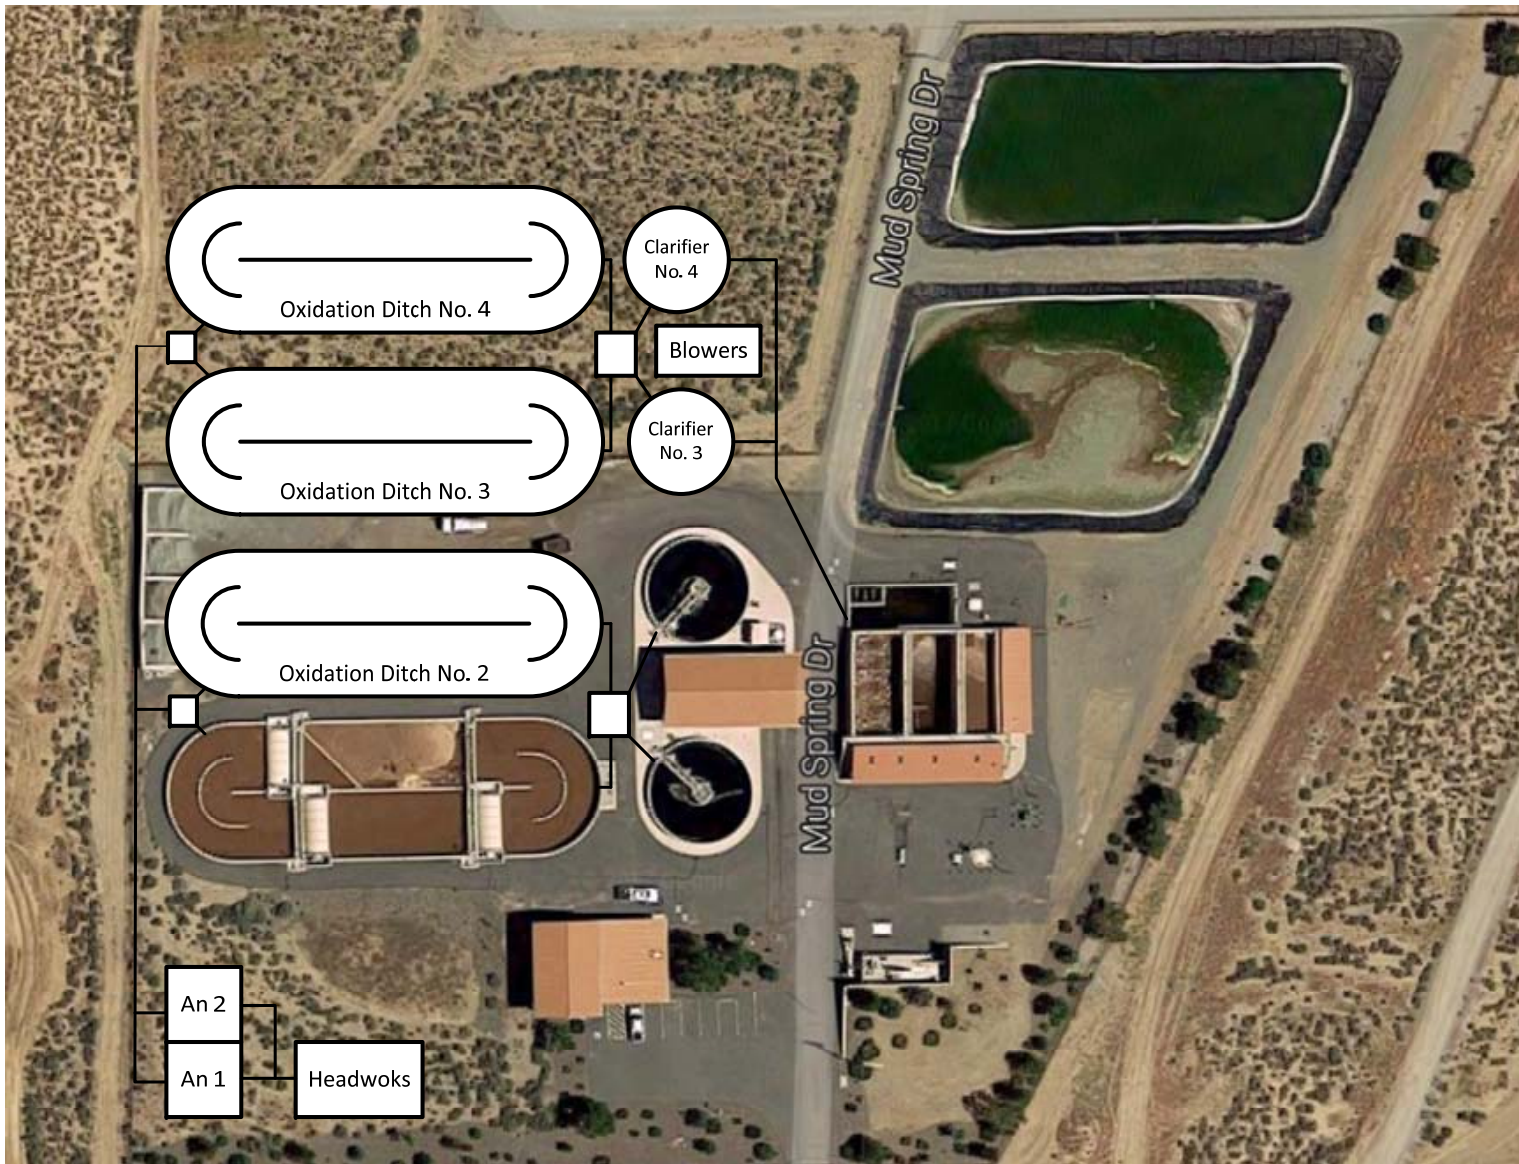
Option 1 – Four Oxidation Ditches – Site Layout with Headwoks
